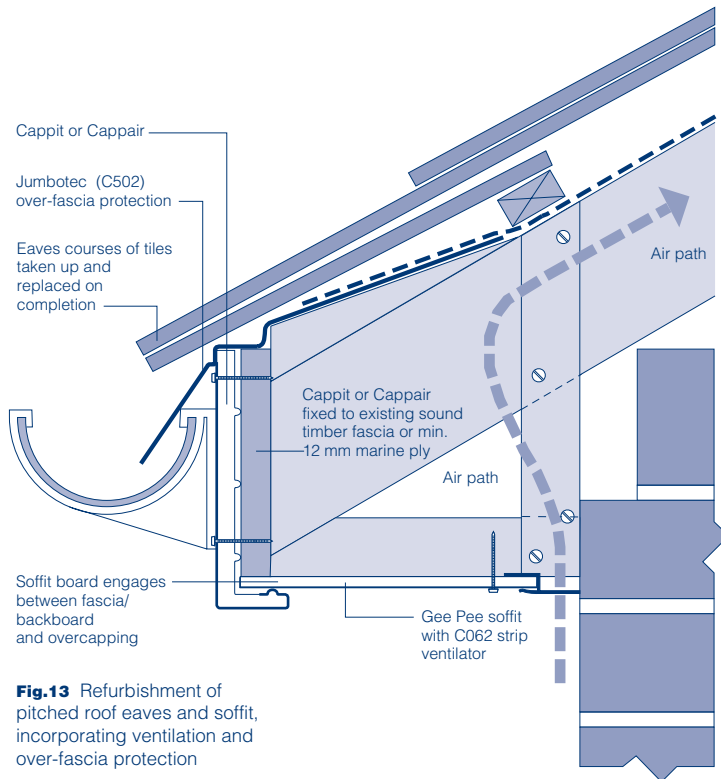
Refurbishment of pitched roof eaves and soffit, incorporating ventilation and over-fascia protection
